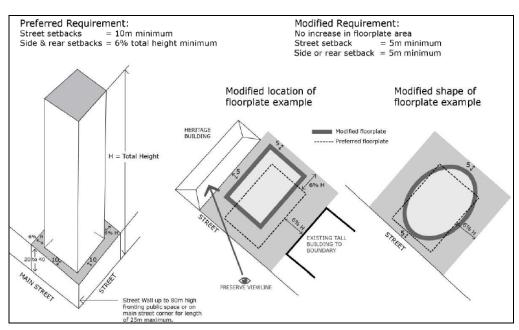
DDO10 Setback requirements for towers greater than 80 metres in height
